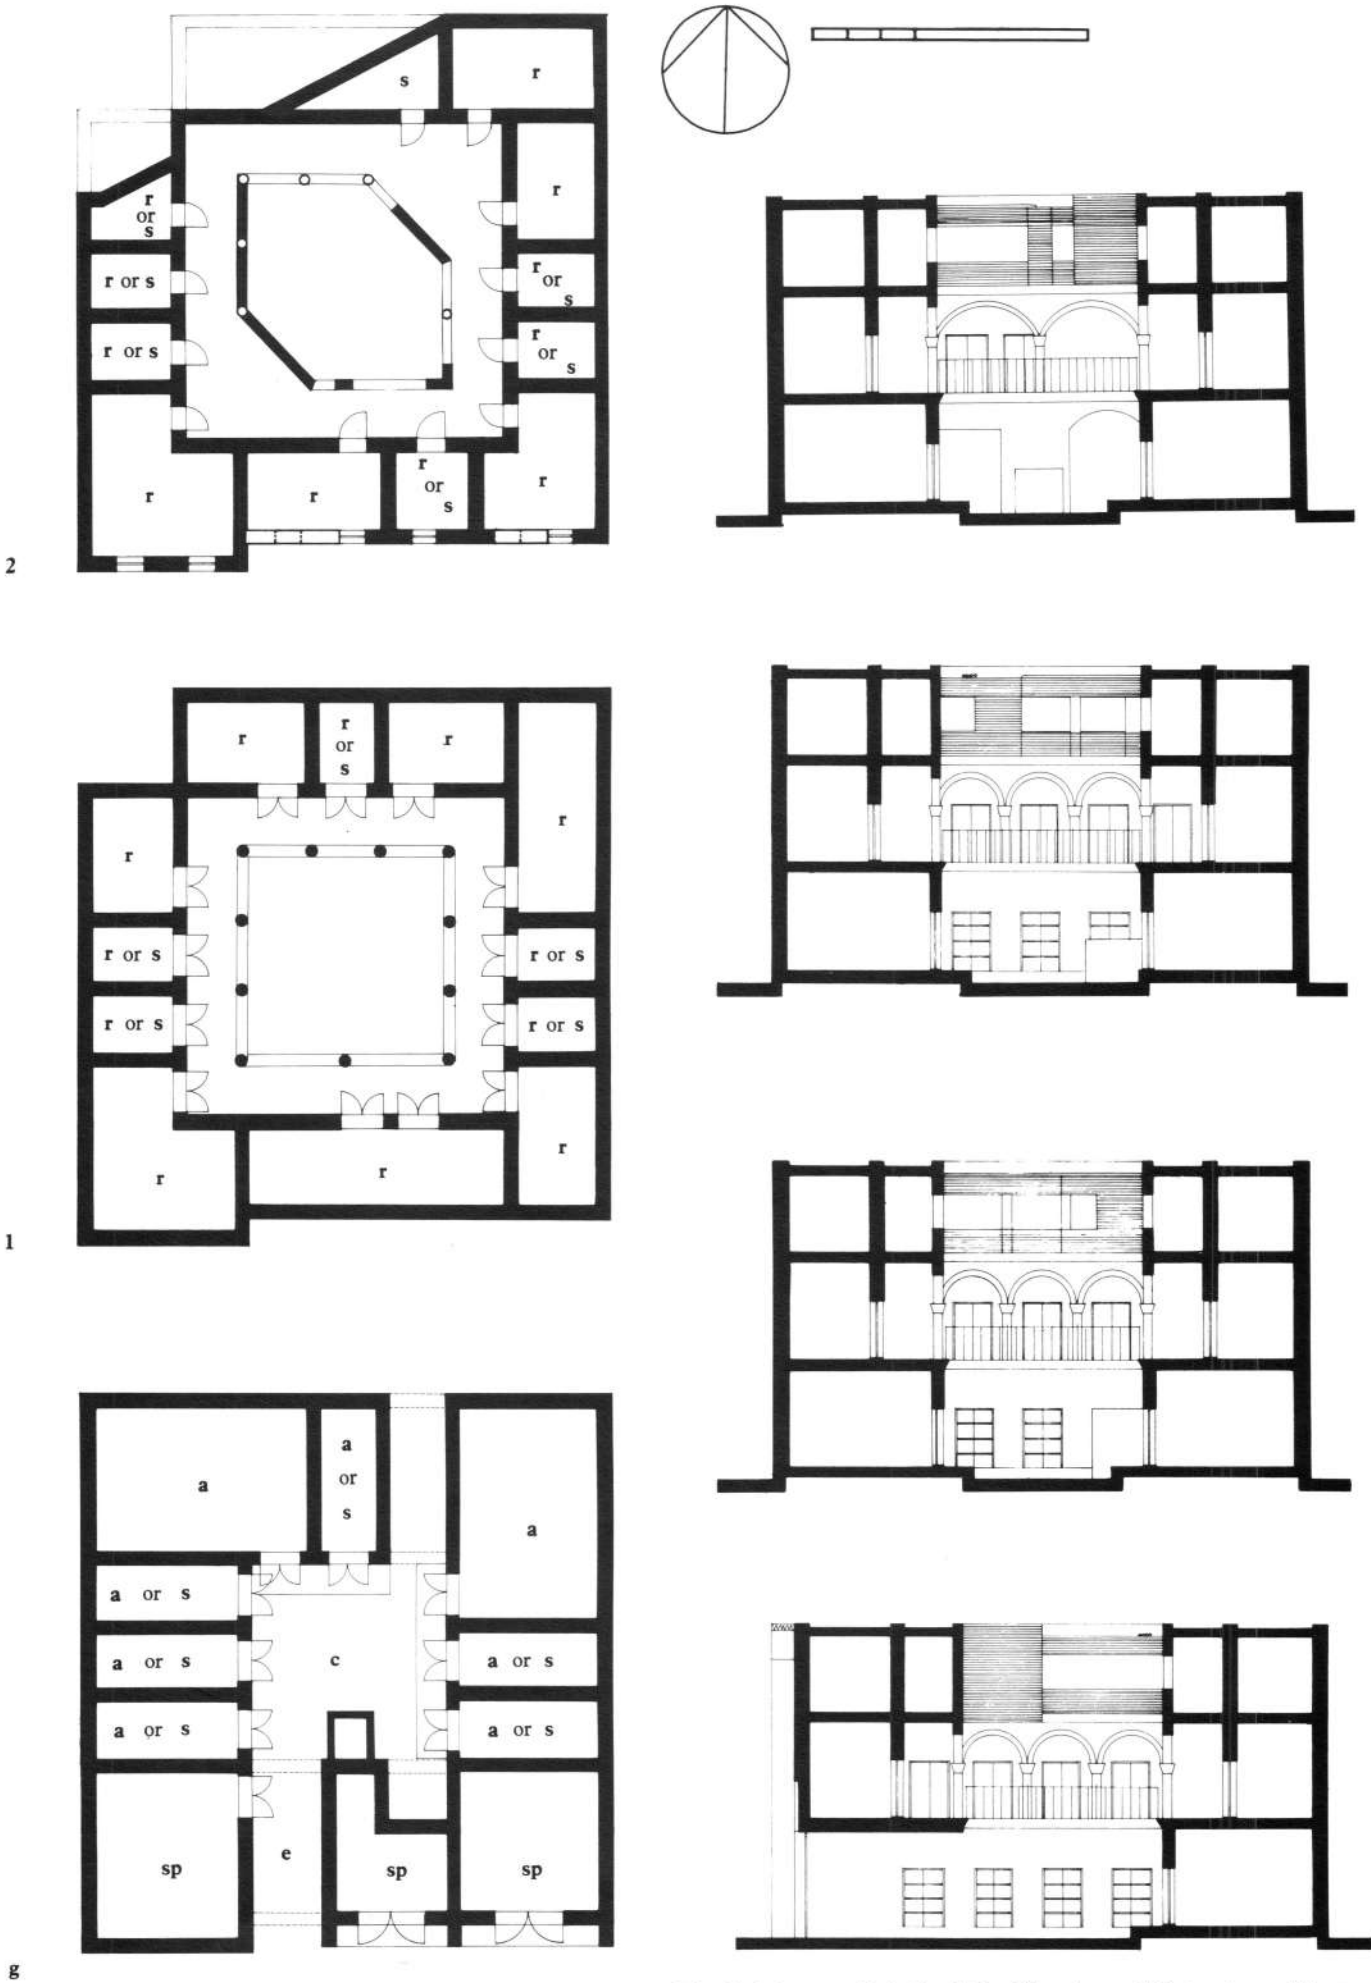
Samsarat Yahya b. Qasim. Plan of ground, first and second floors, with four sections.
